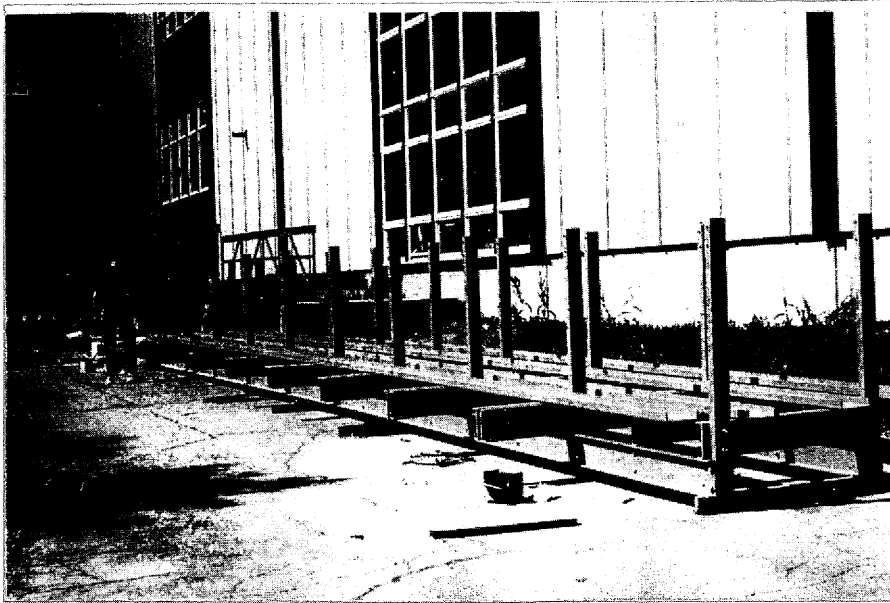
Construction of 45'-6" Bridge at USFS Testing Lab - Madison, WI
